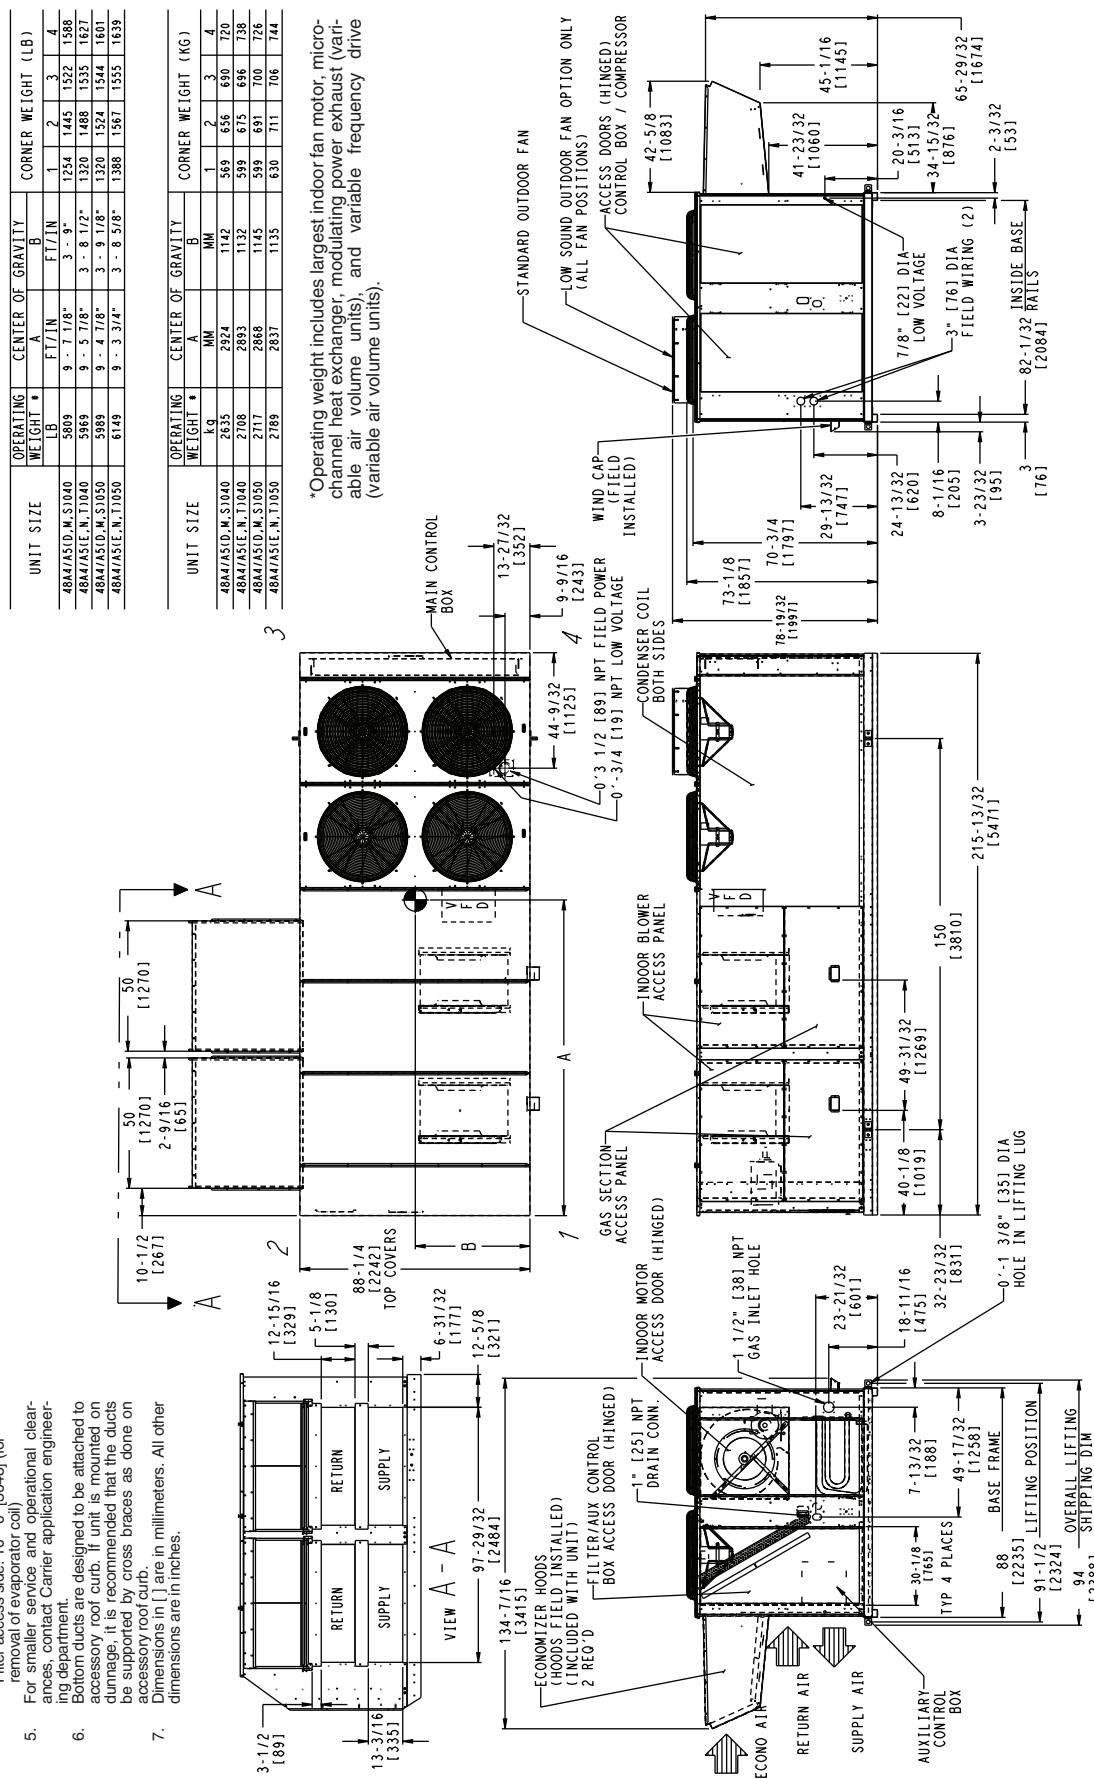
Base Unit Dimensions — 48A4-A5040-050
